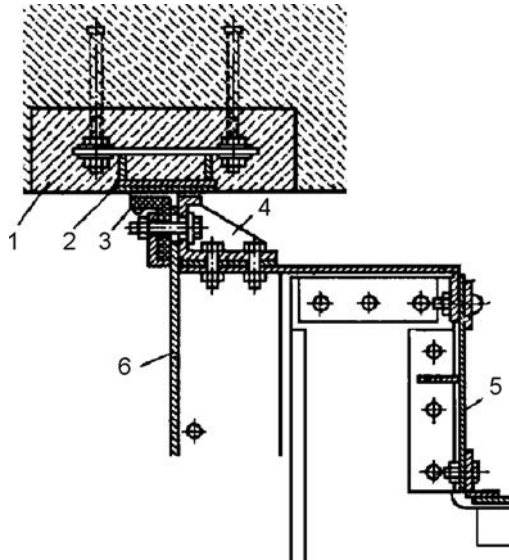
Constructional shaping of a lateral seal in a radial gate. (1) Concrete; (2) guide member, embedded in concrete; (3) rubber seal; (4) stiffening element; (5) lining of the gate at the downstream side; (6) lining of the gate at the upstream side.
